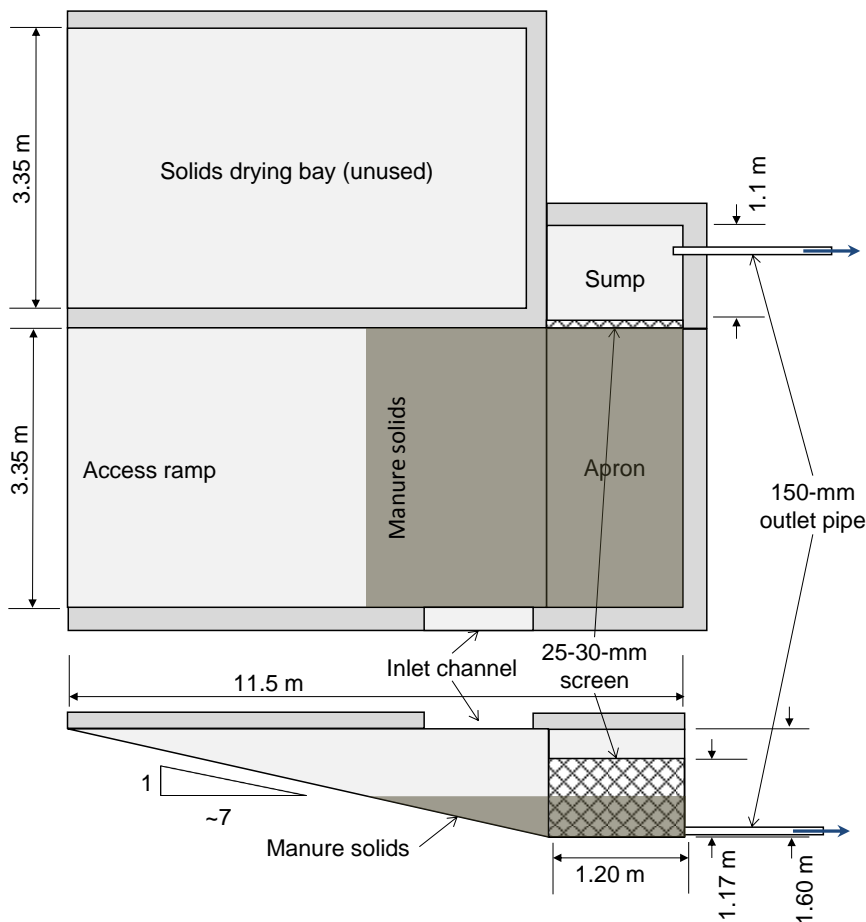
Plan view and cross-section elevation of the solids trap (not to scale).
